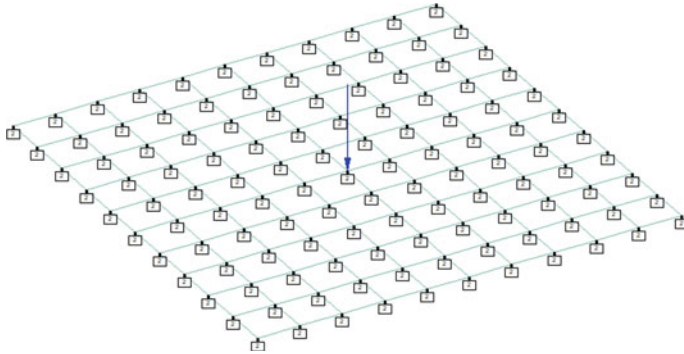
Typical isolated foundation with point load in STAAD Pro.
